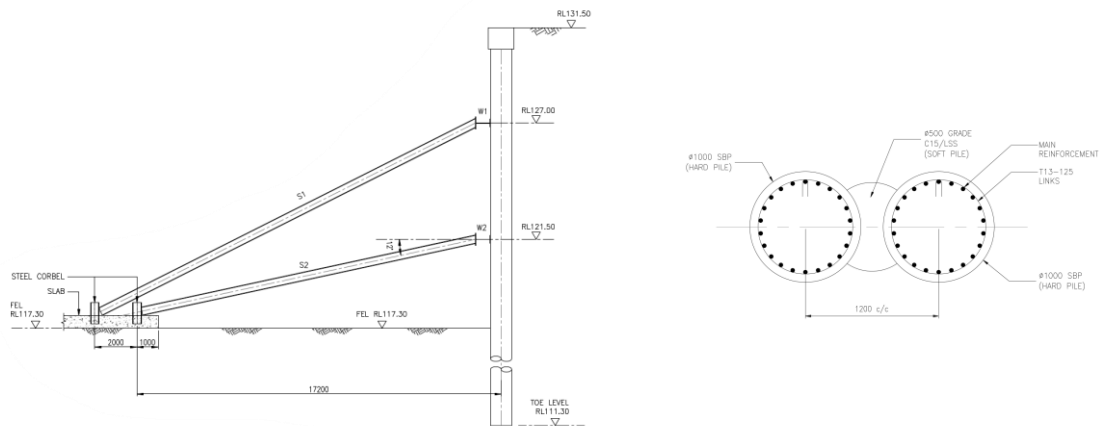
Typical raker strut system (left). Typical SBP wall arrangement detail (right)
